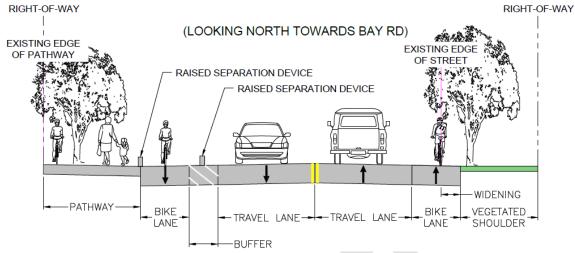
Ringwood Avenue (Laurel School Lower Campus) Preferred Alternative Bike Lanes (Protected near Schools) with Off-street Pathway
